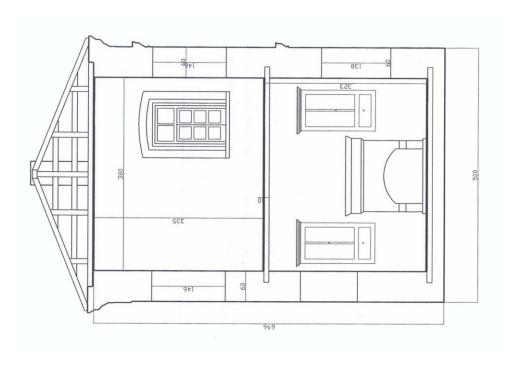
Section B-B view of 11-Hamam Street Scale: 1/75
